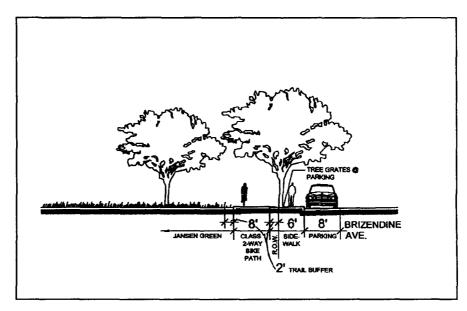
Bike Path & Pedestrian Walk at Jansen Green Adjacent to Brizendine Avenue On-street Parking
